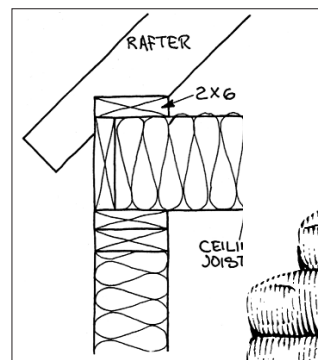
To get full insulation at the eaves, use raised-heel trusses or set rafters on top of a 2x6 sitting above the joists, as shown.
